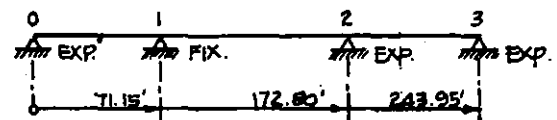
Structure of Example 1 (Three-span continuous bridge)
